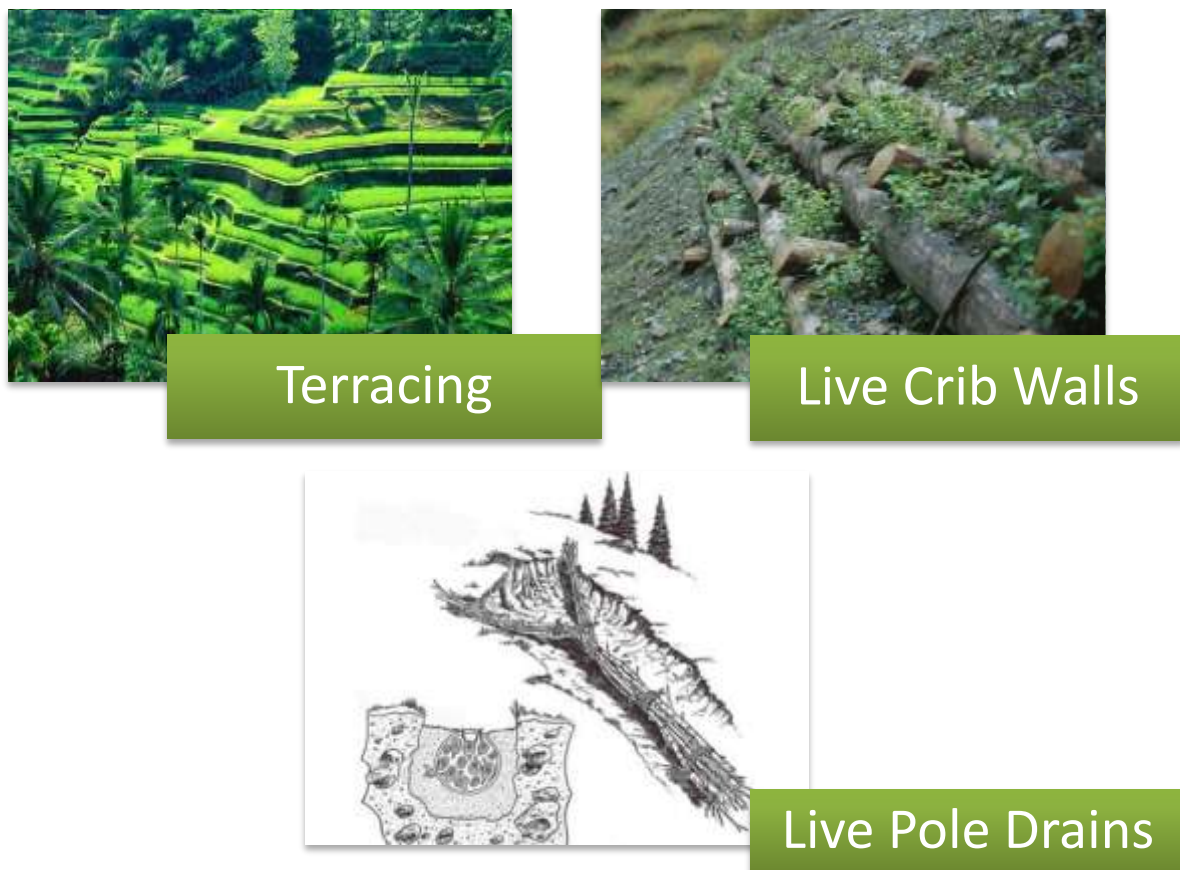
Terracing, crib walls and pole drains (Image Credits : LARIMIT)
